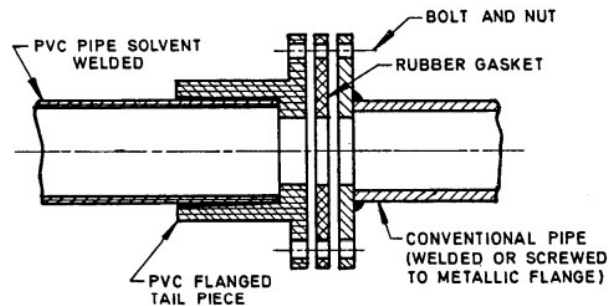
Flange Joints (Jointing PVC Pipes and other Conventional Pipes using PVC Flanged Tail Piece)
